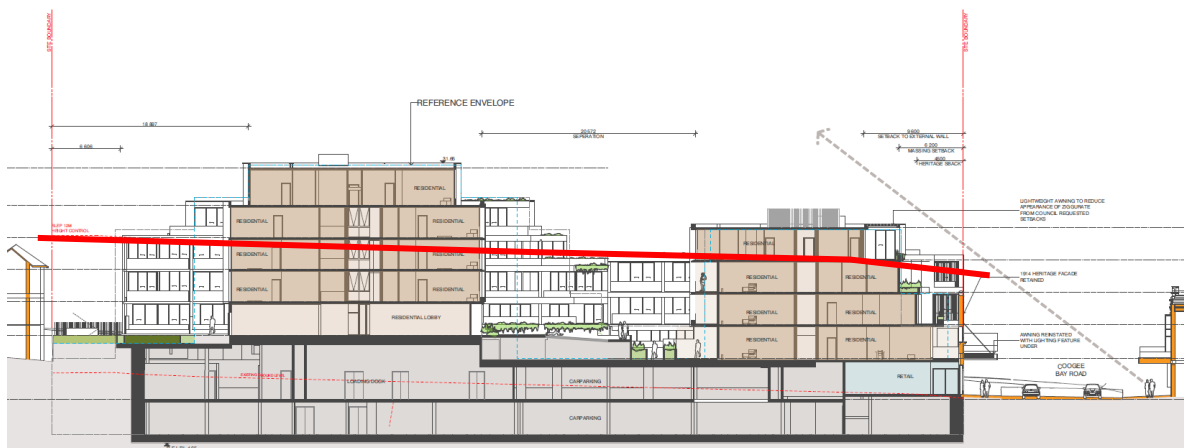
Excerpt of Section BB (Drawing No. DA251 prepared by Fender Katsalidis)
